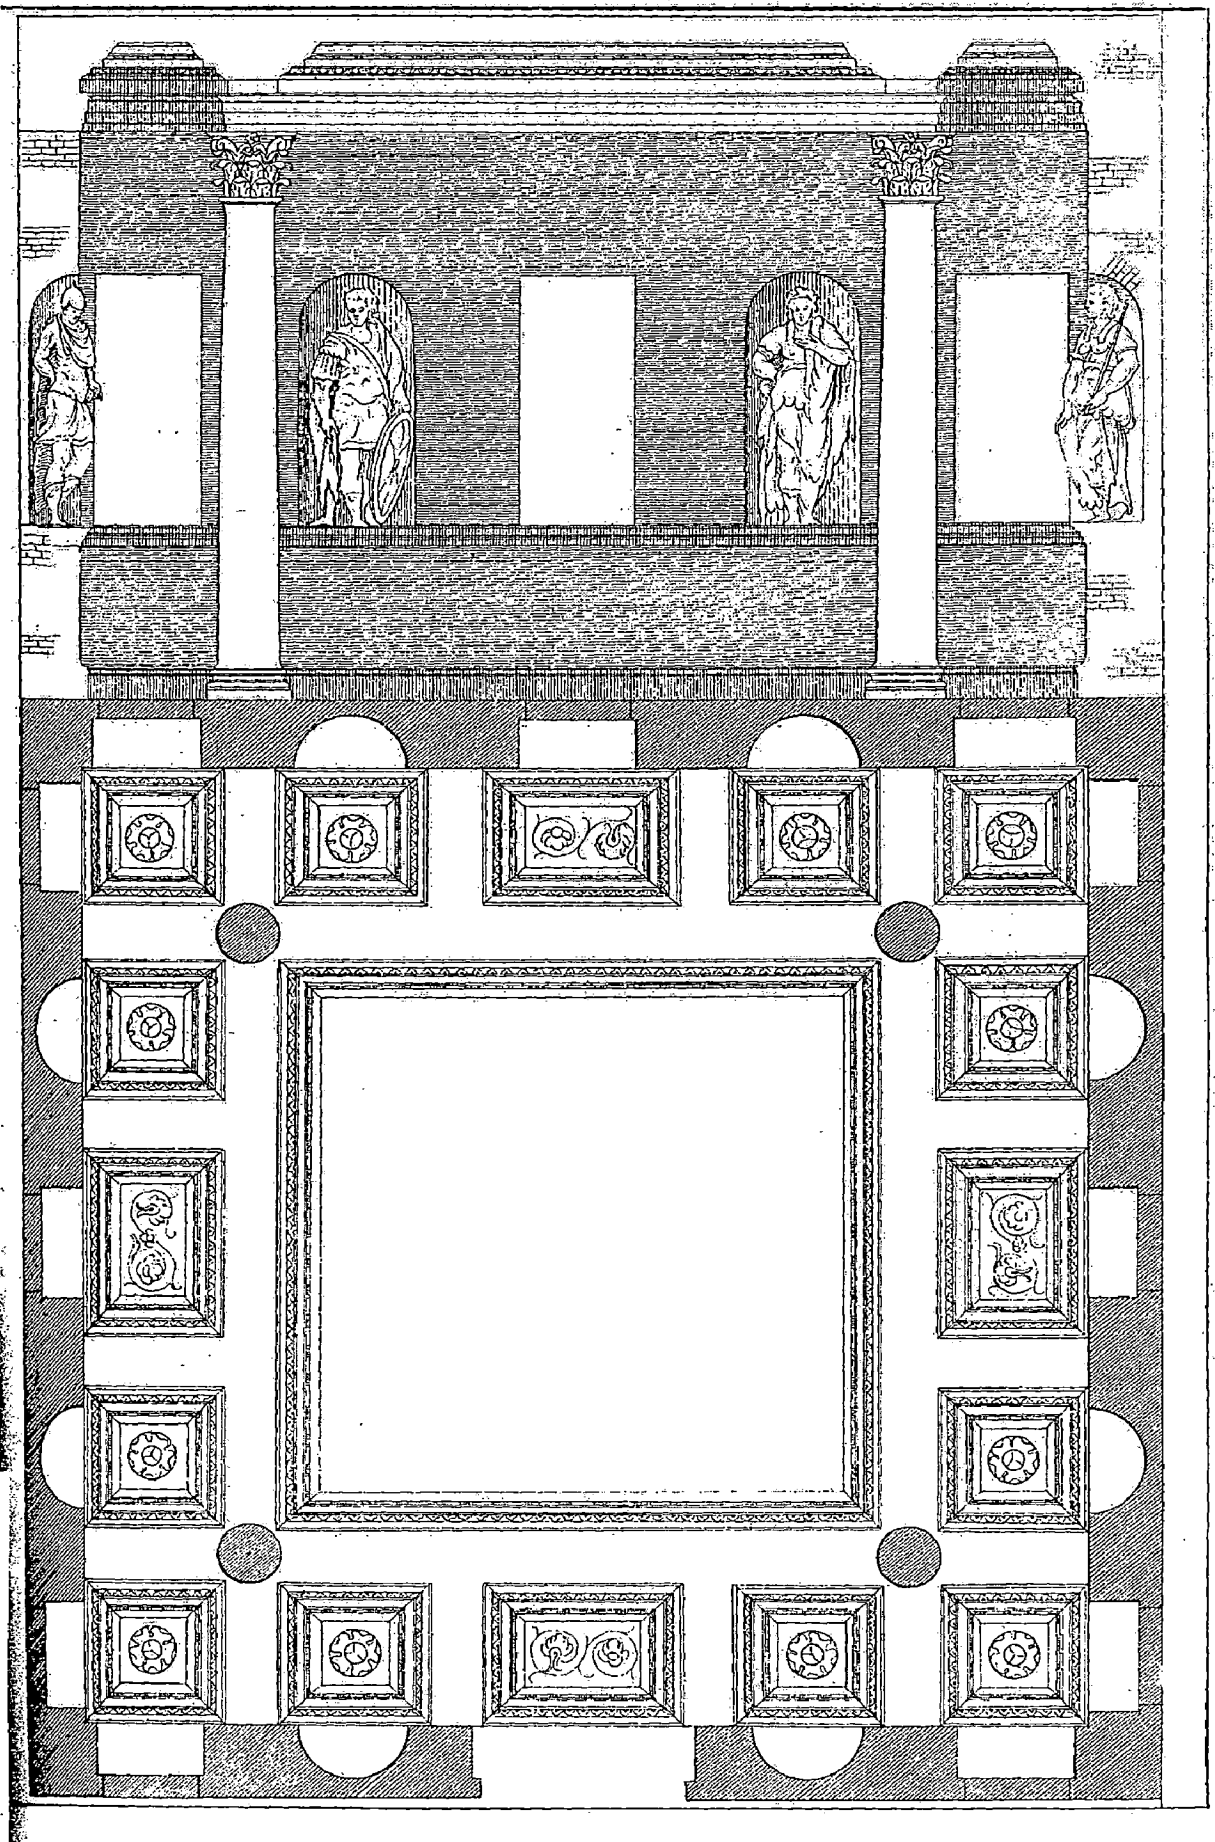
A tetrastyle hall Halls with four columns in plan and sectional elevation
